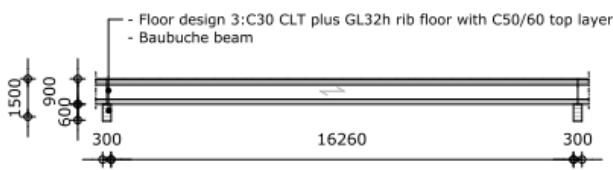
Cross-section C-C BauBuche beam in mm maximum height
